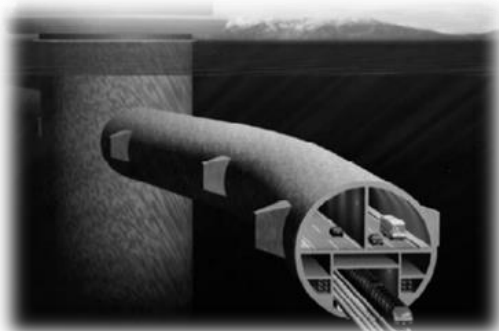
Trader submerged floating tunnel specification and planned tunnel modeling
